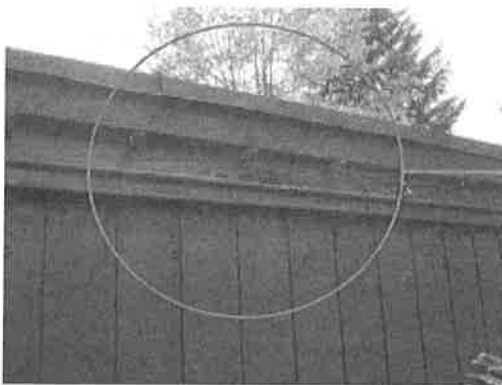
Fascia at North Elevation Roof Curb
